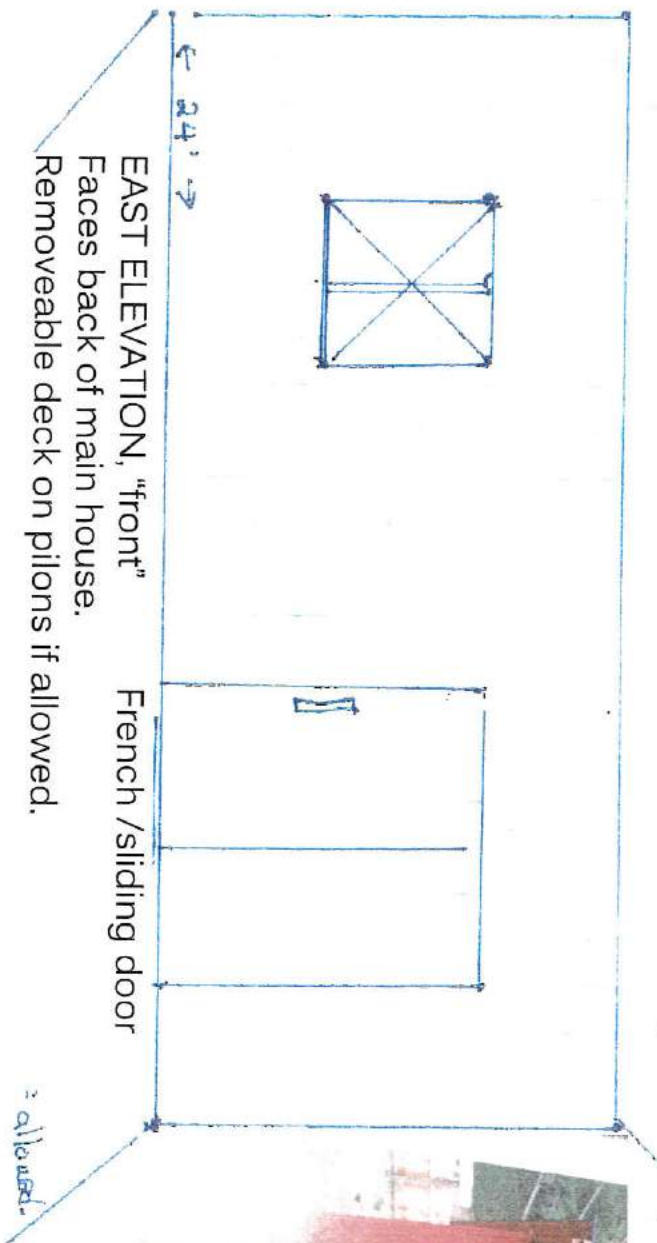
APPLICATION, SITE PLAN, ELEVATION
